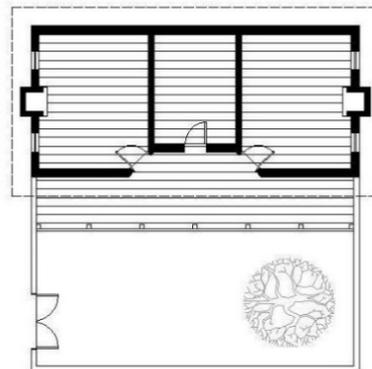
Plan of Ula House Type 2 (*mabeyn* type) with an open, longitudinal outer *sofa*. Drawing by author (Uysal, 2012).
